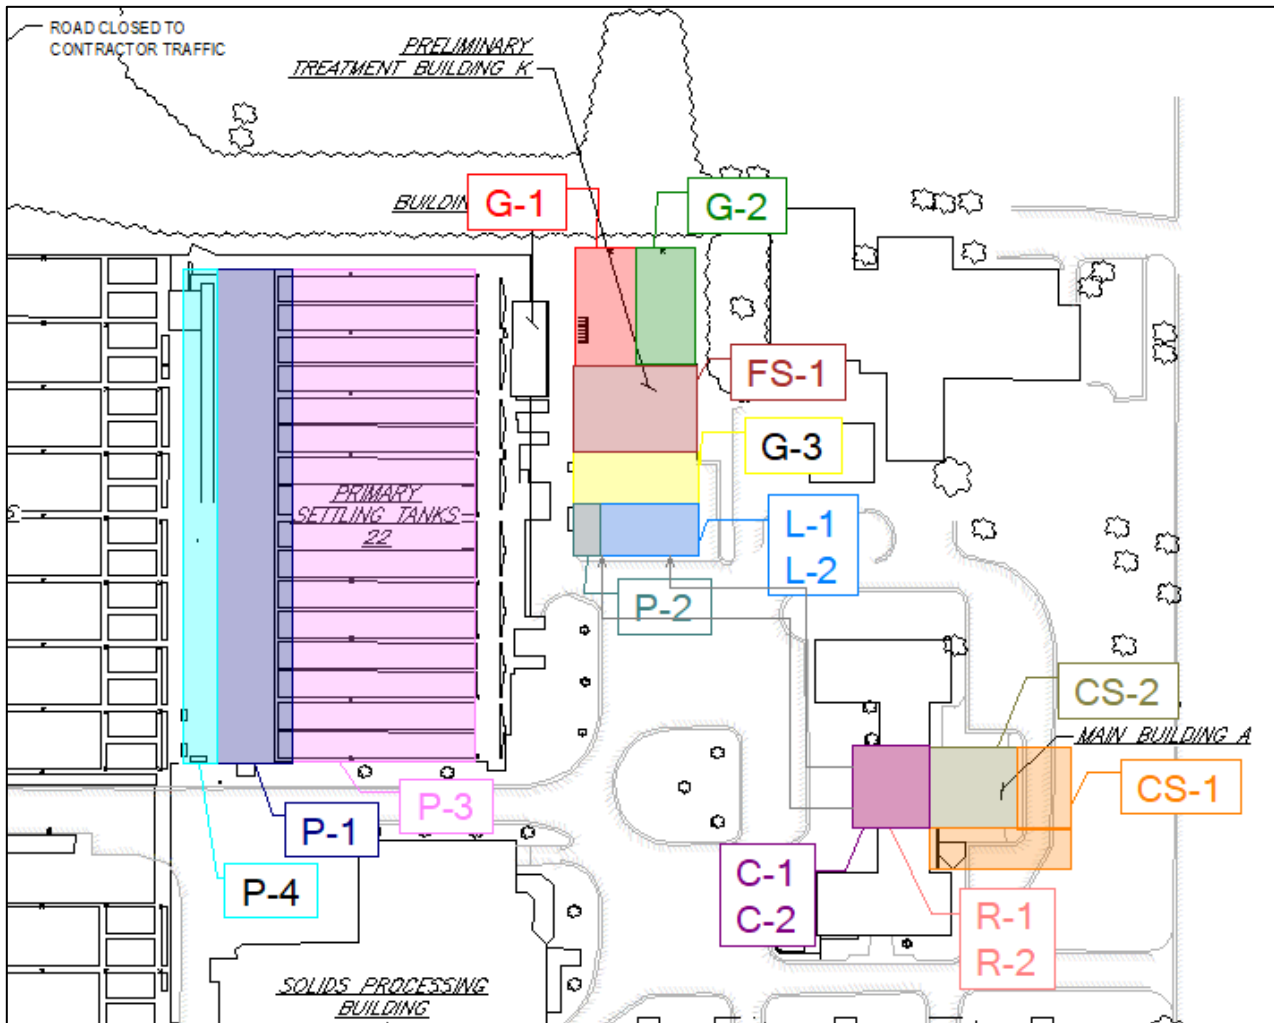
Partial Site Plan Showing All PPSU Recommended Projects
